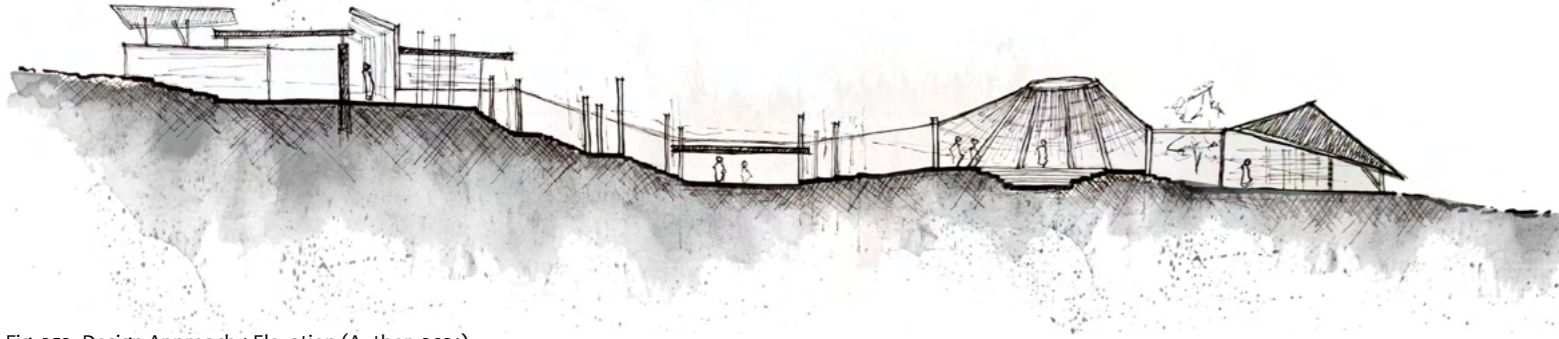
Design Approach 1 Elevation (Author, 2021)
